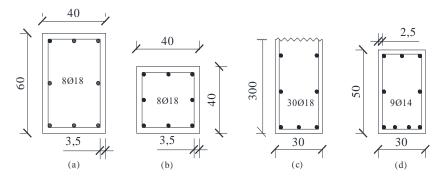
Section properties of the building used for columns, shear wall, and beam (cm)
